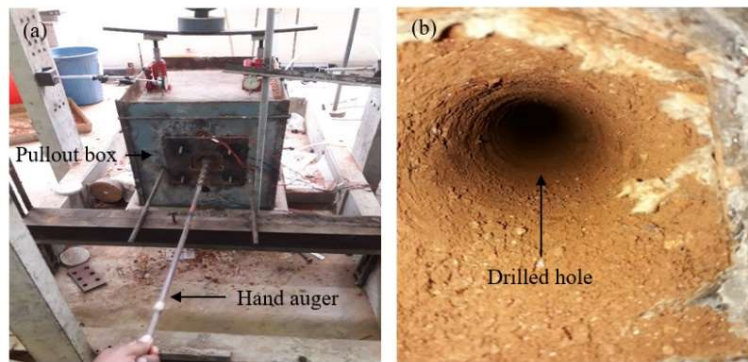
Drilling process (a) drilling a hole using a hand auger; (b) drilled hole
